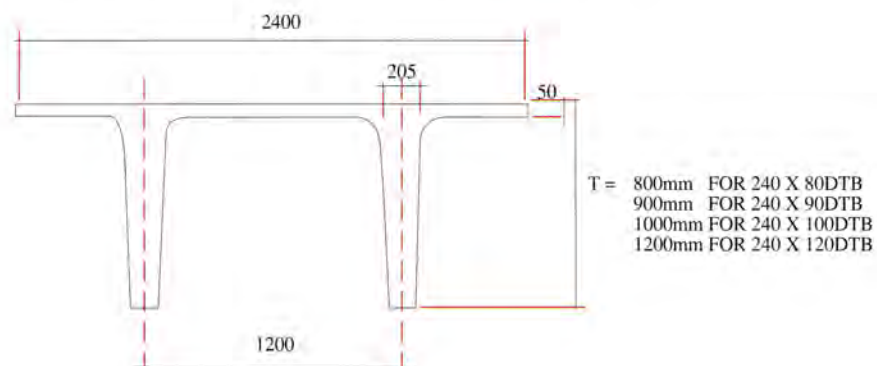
TYPICAL SECTION OF VARIOUS PRECAST SLAB ELEMENTS
